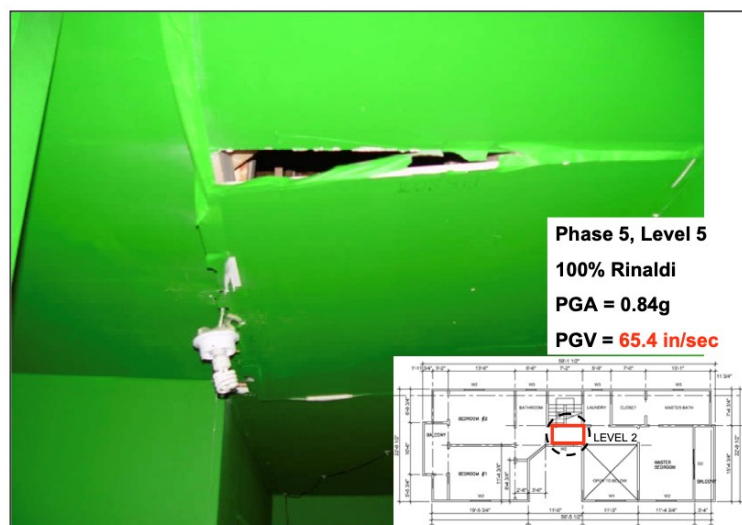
Separation of Gypsum Wallboard from Ceiling (Christovasilis et al., n.d., 2009)
